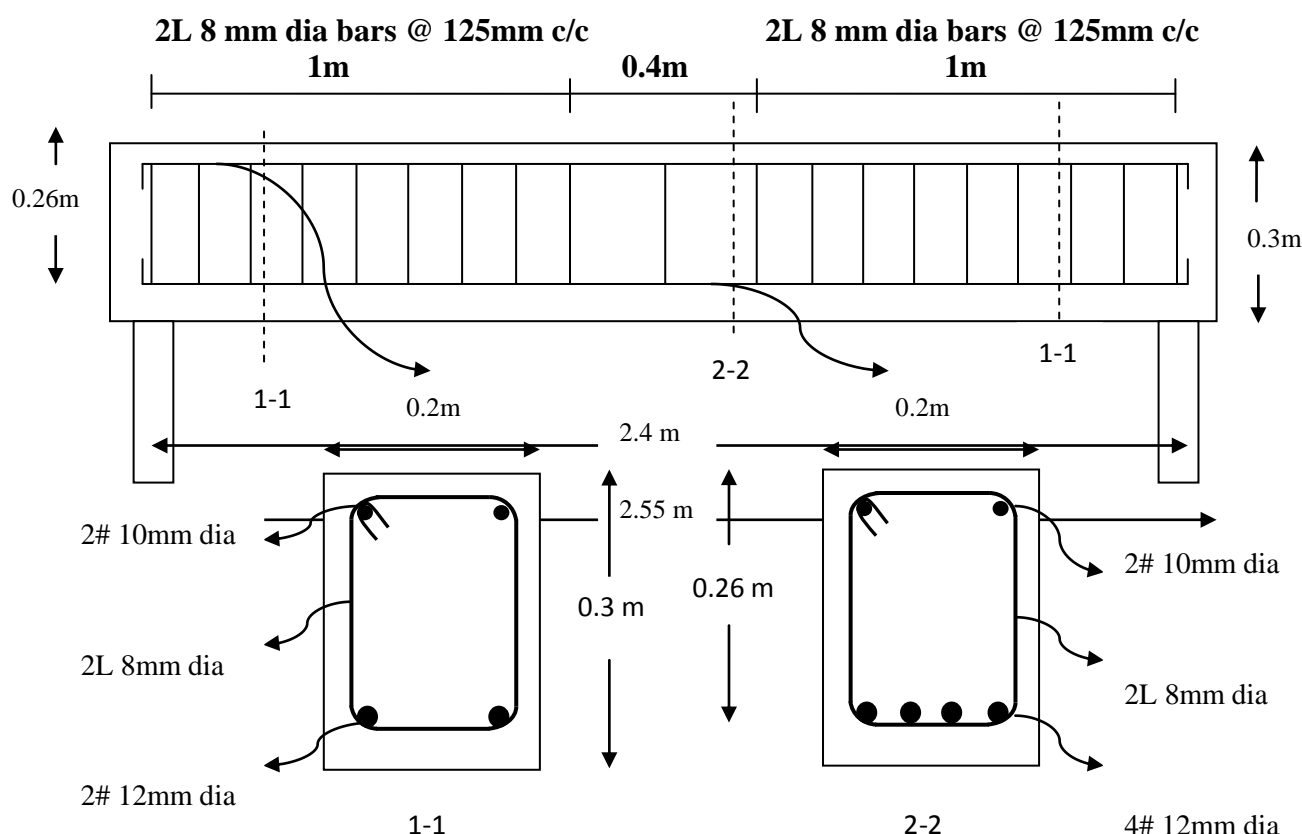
Beam size and reinforcement details- Span, Support section, Mid span section
